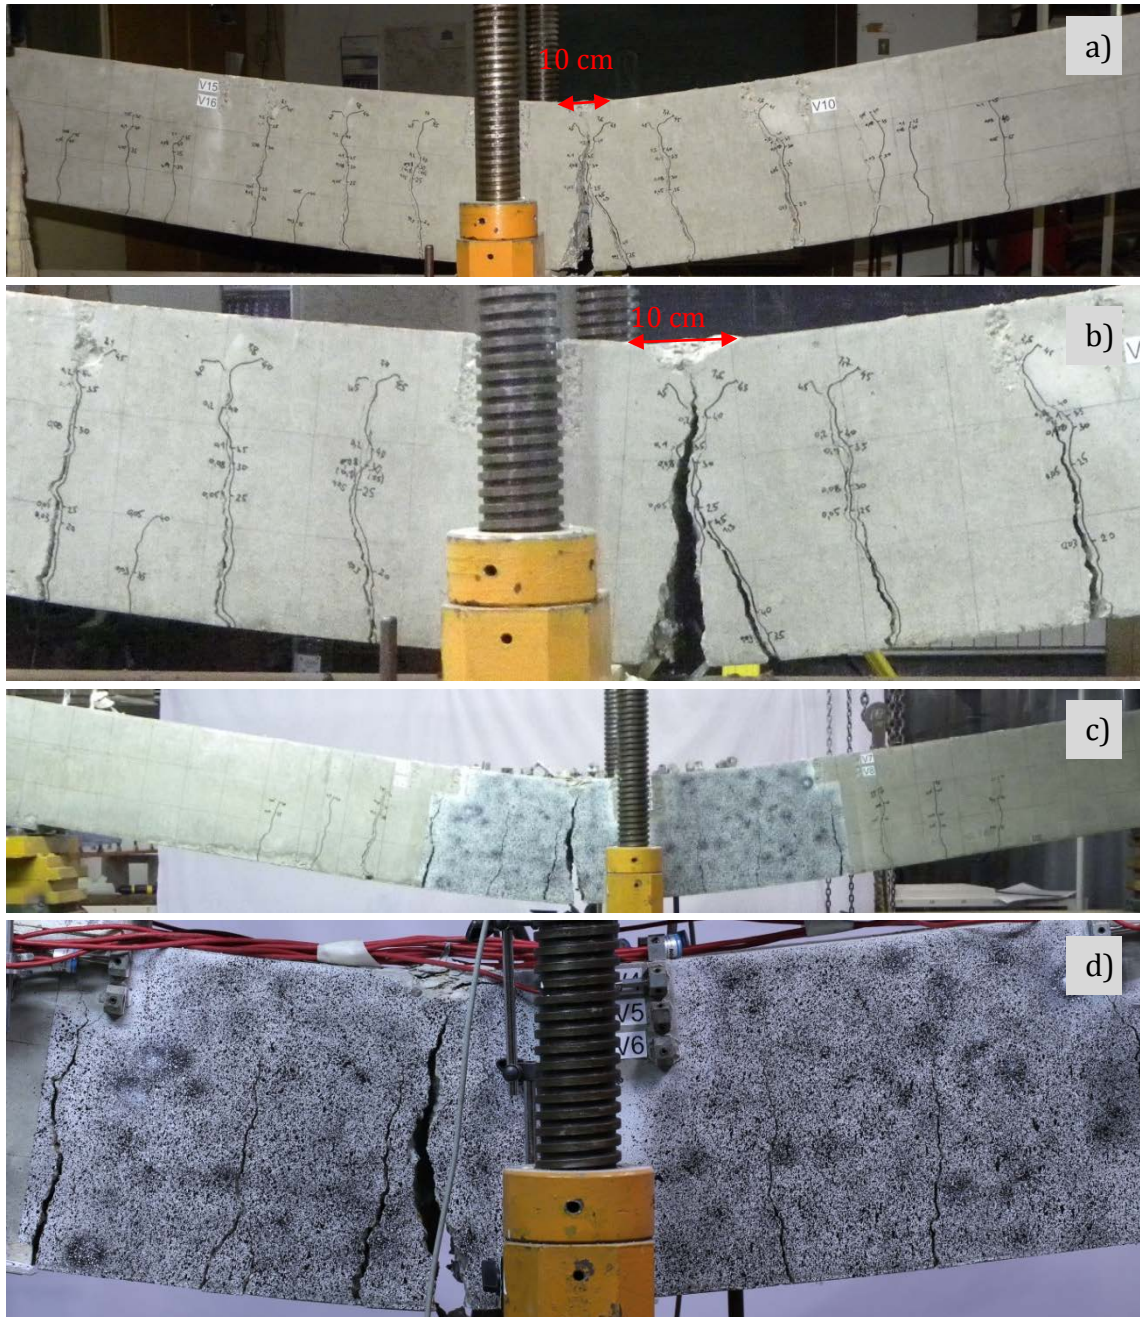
Crack patterns at failure load for the OPC-1 beam: a) back side of beams' clear span, b) backside of beams' flexural span, c) front side of beams' clear span and d) front side of beams' flexural span
